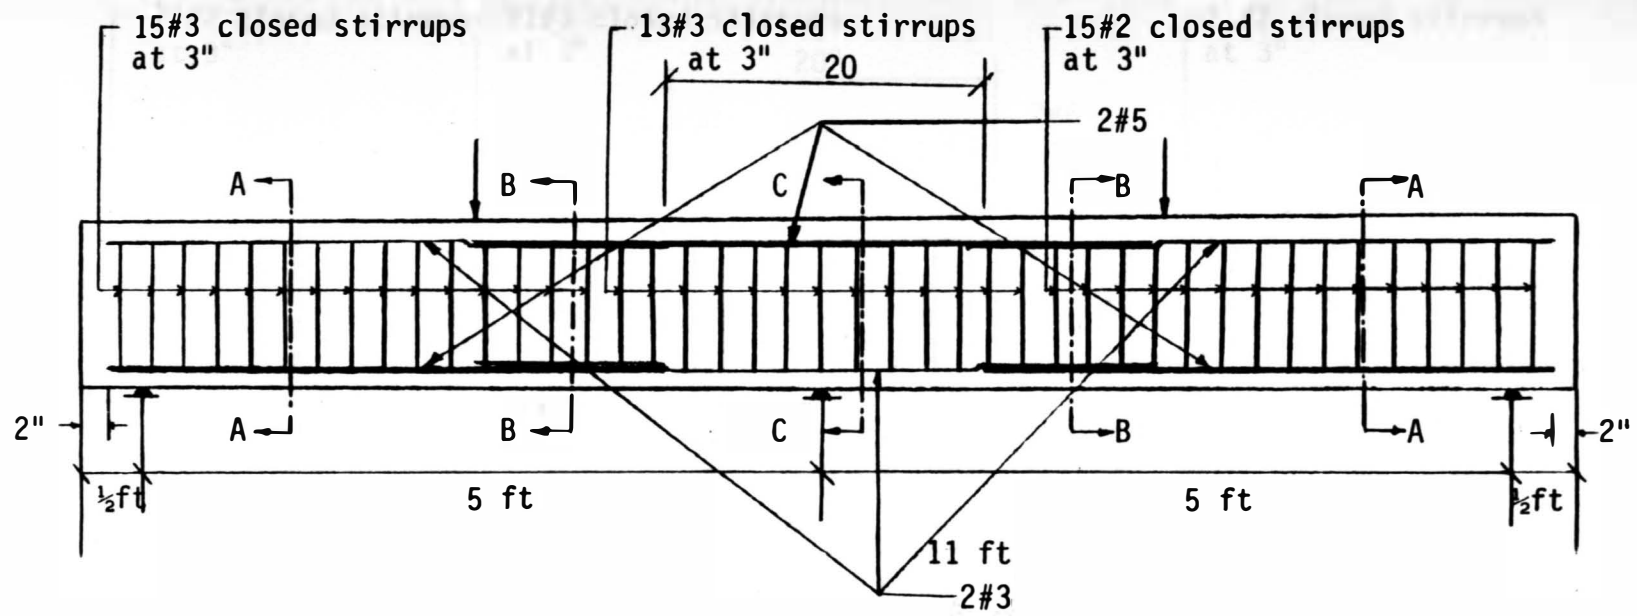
Reinforcement details of continuous beams 2, 5 and 8.
